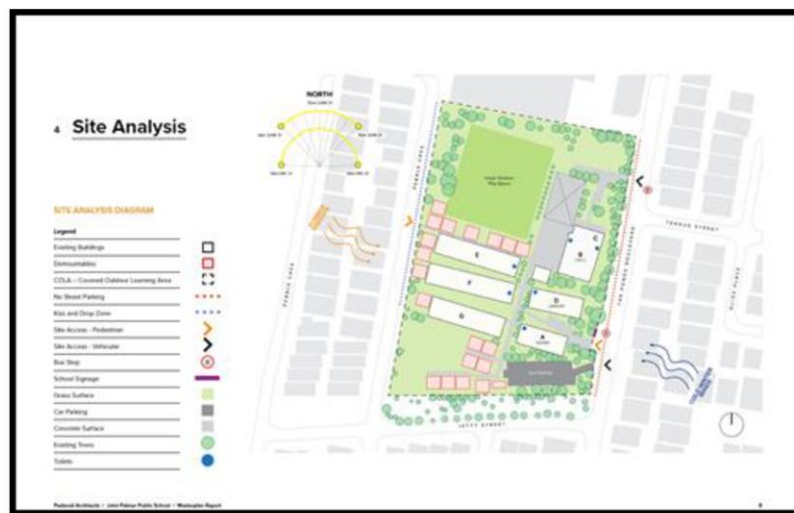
Existing site layout for John Palmer Public School. Source: Master Plan Report, Pedavoli Architects.
